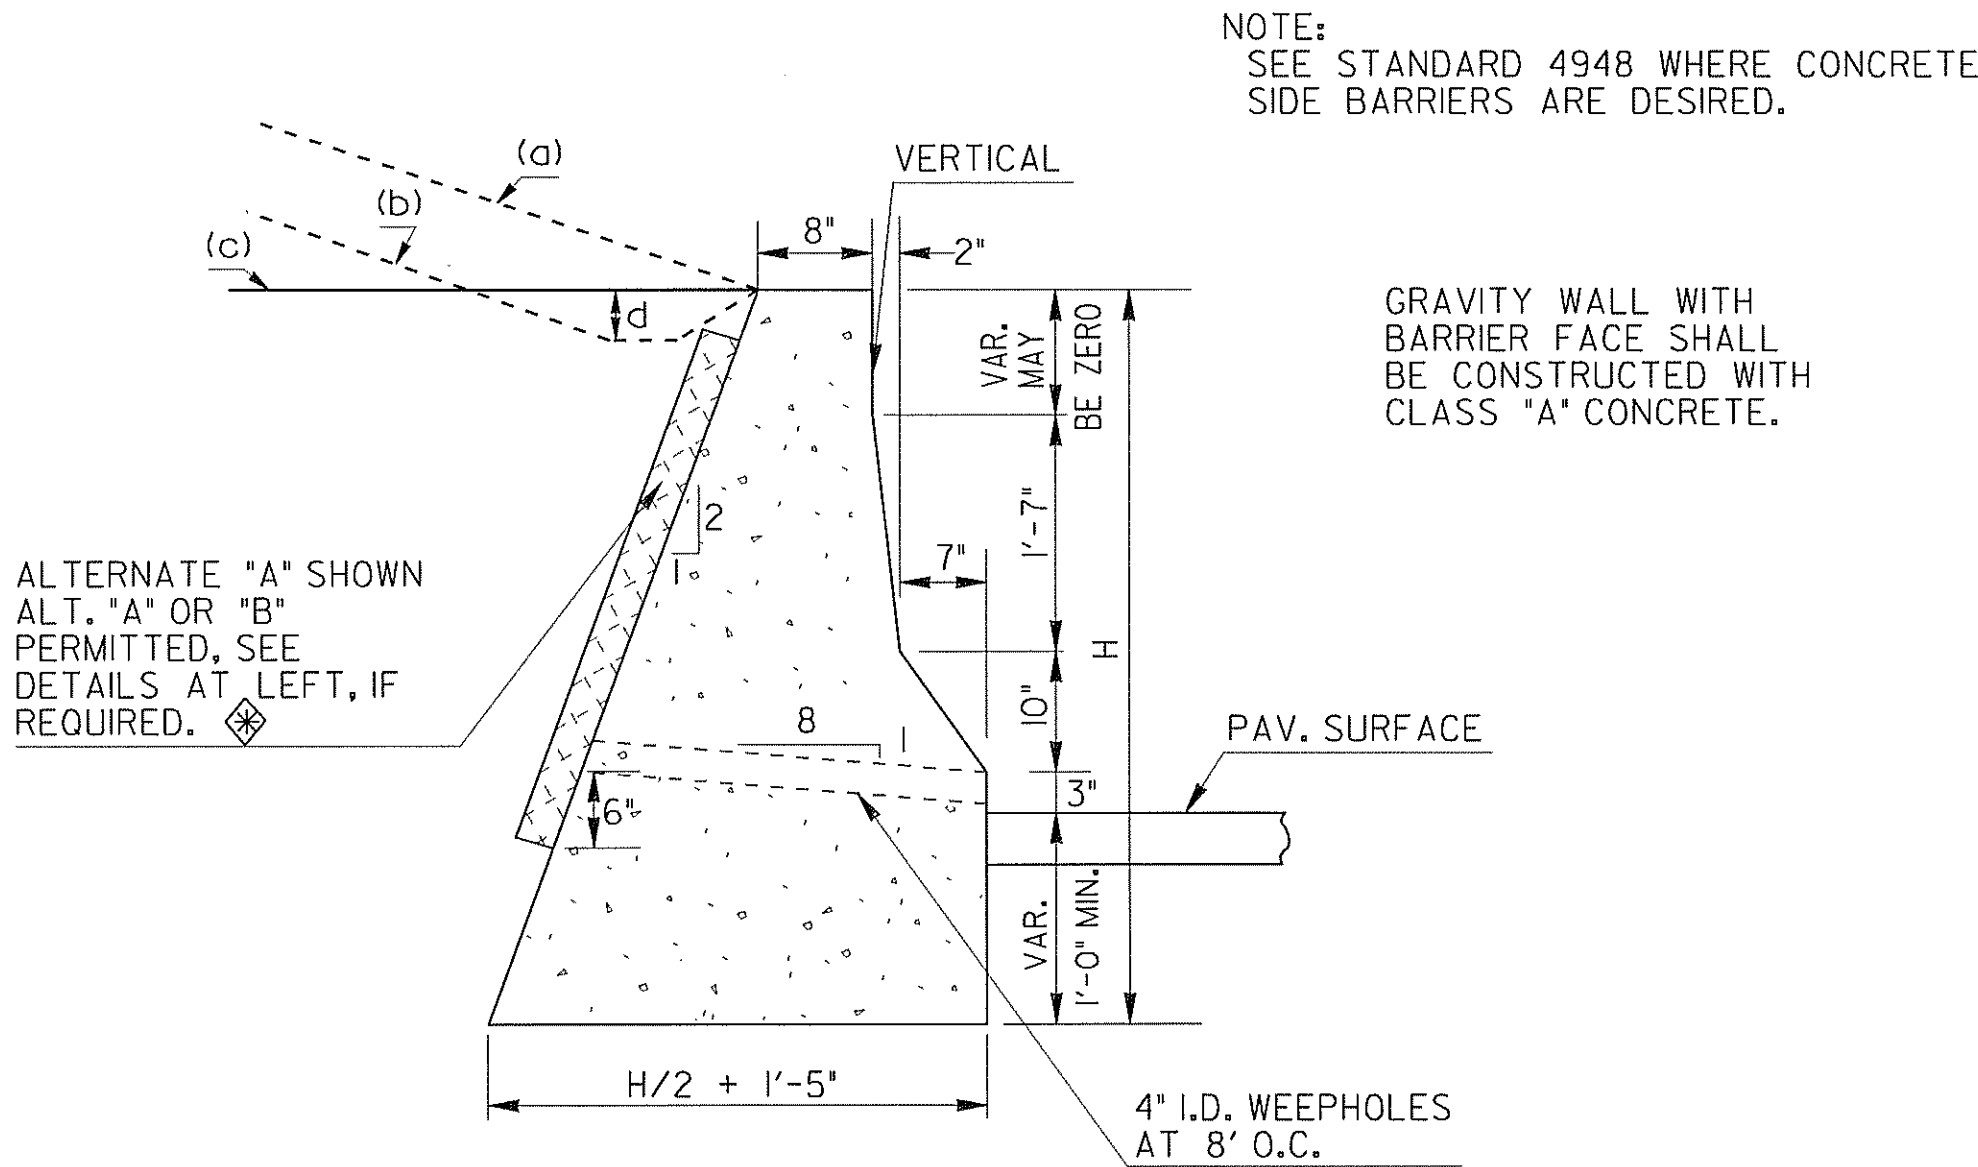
DETAILS OF RETAINING WALL TYPICAL SECTIONS
